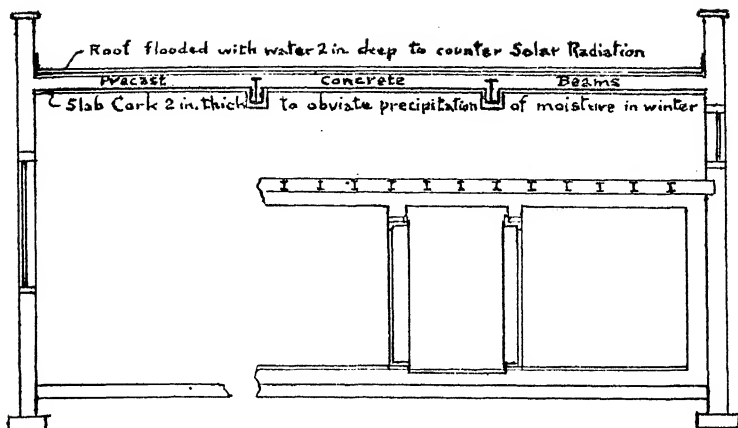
ELEVATION AND PLAN OF TYPICAL SMALL FACTORY WITH COLD STORES WITH DOUBLE-SKIN ROOFING
